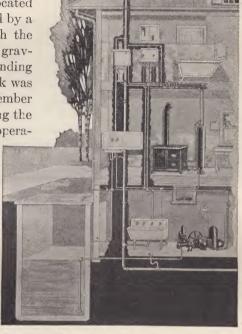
Myers Home Water System installed in basement. Myers Water Systems are designed for both inside and outside installation.
